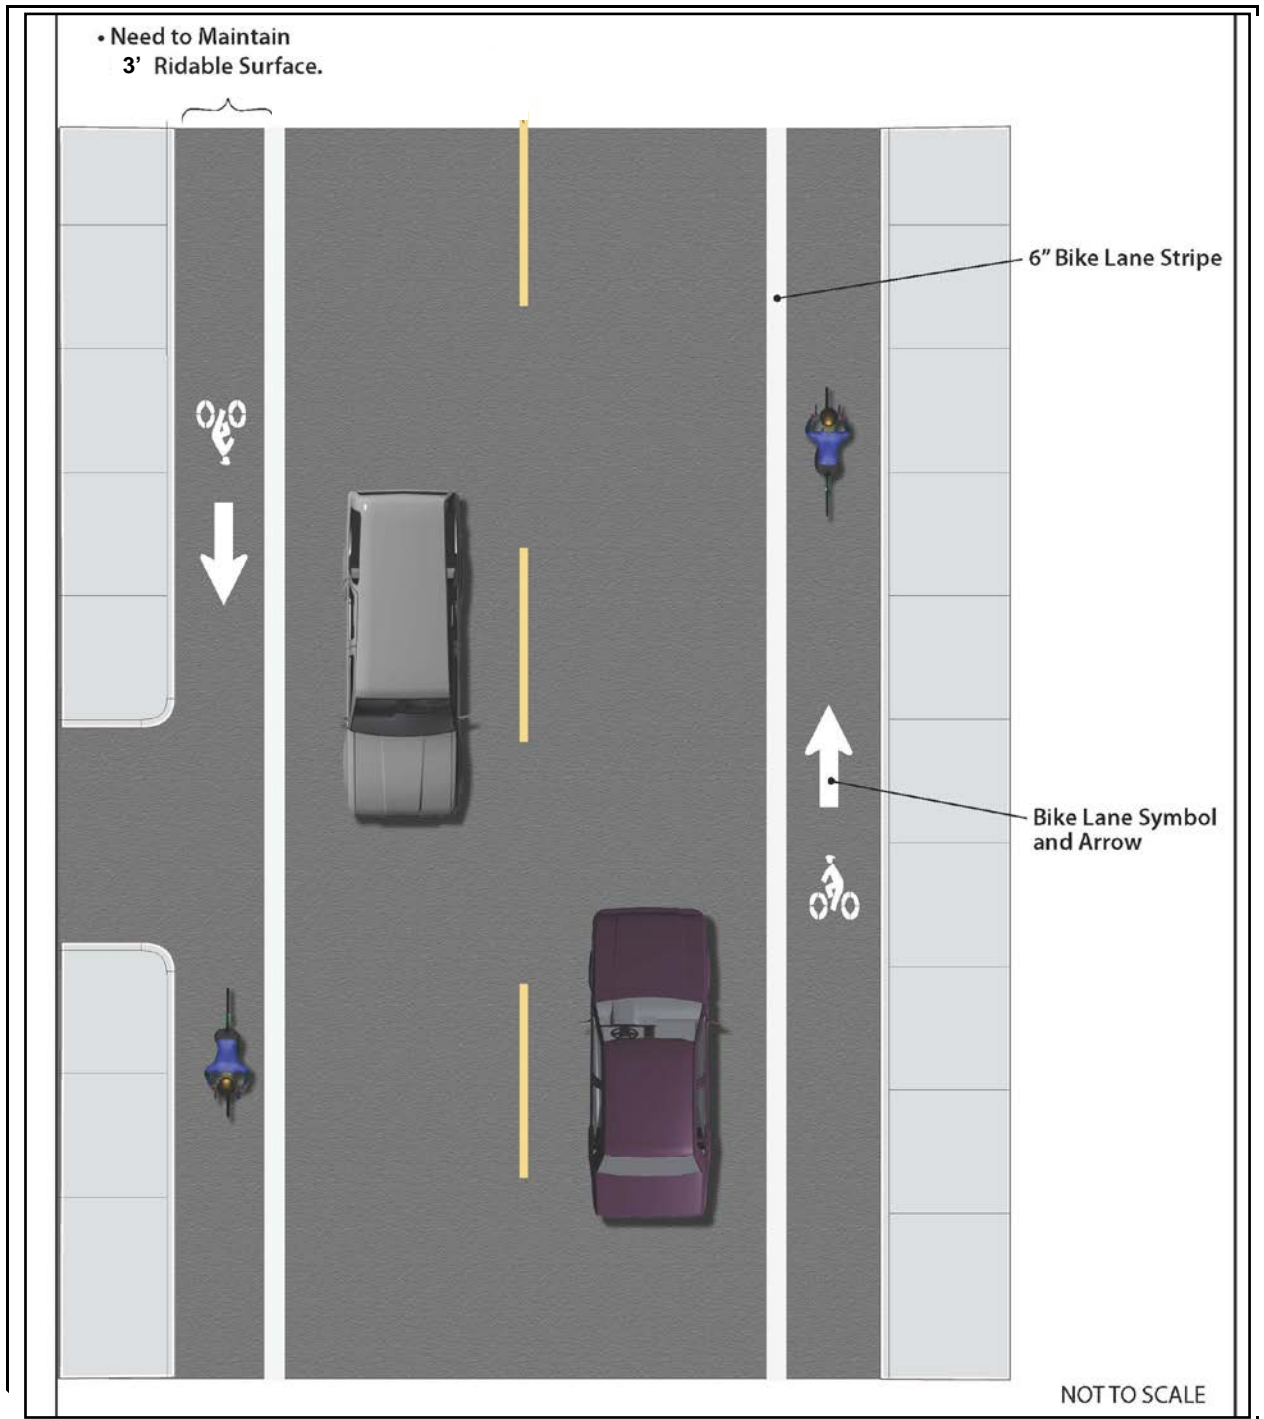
Typical design of bike lane where on-street parking is not permitted. (source: Fehr and Peers)
